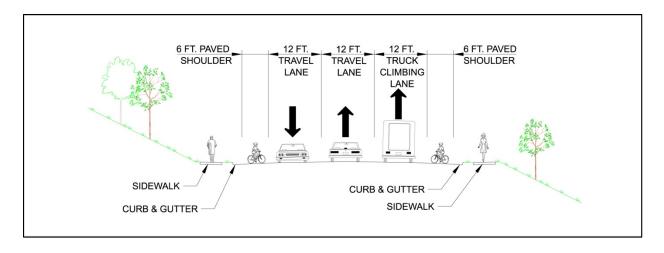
SECTION 2 WEST OF HAWTHORNE STREET TO HARBOR CHAPEL ROAD
